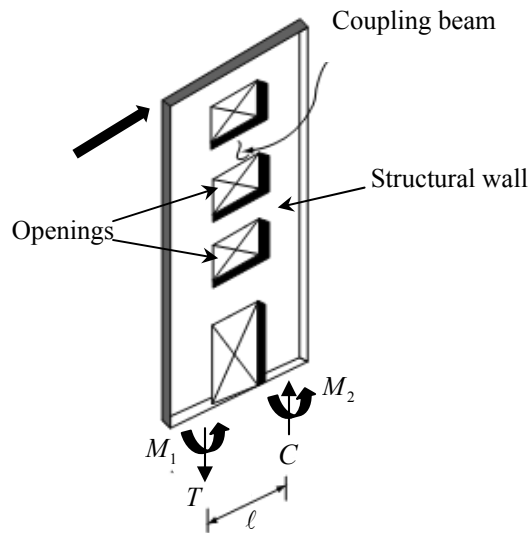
Coupled walls and coupling beams (Taranath 2010)
